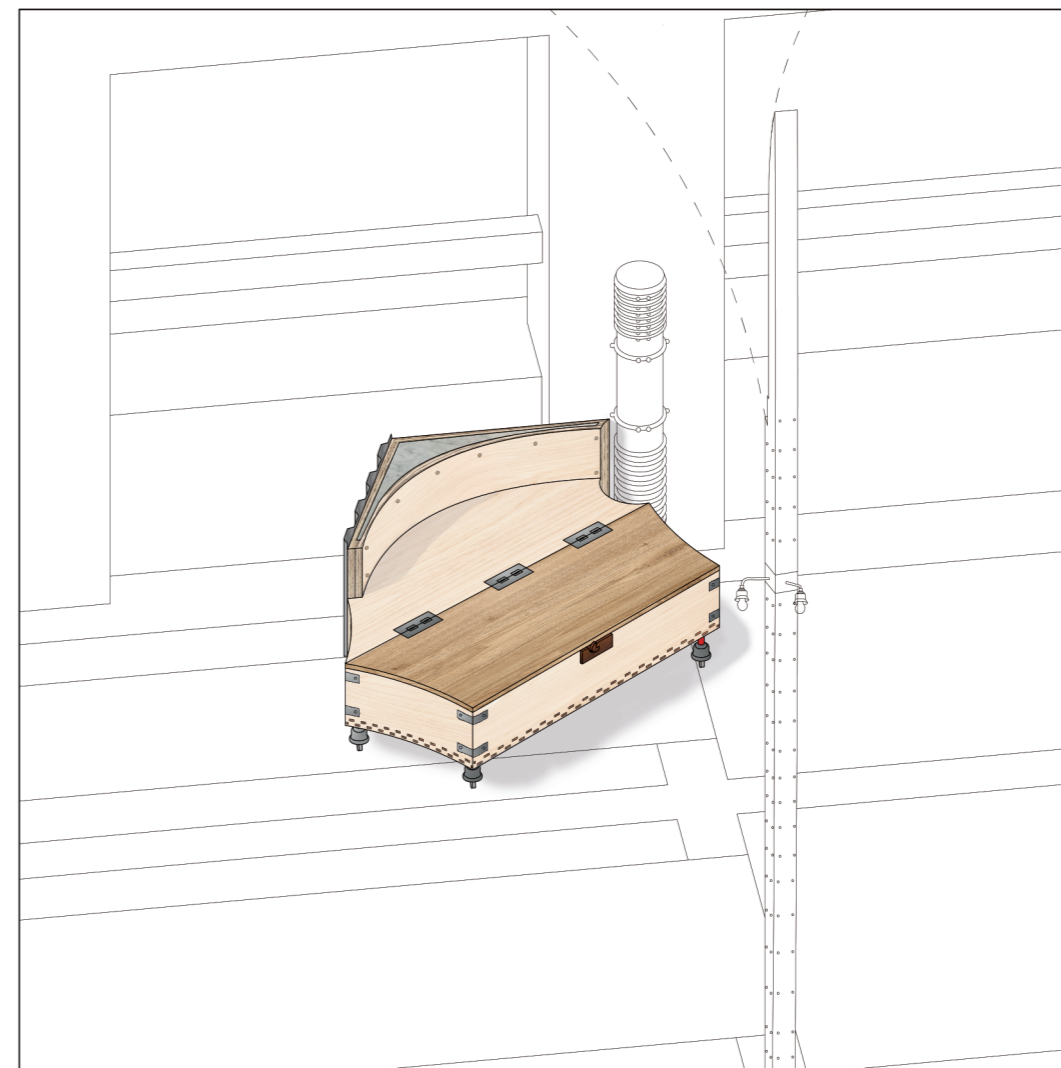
Storage 2 with Detail 4. Combined storage and seating element. Storage space used for foldable tables. Movable. Author's drawing.
